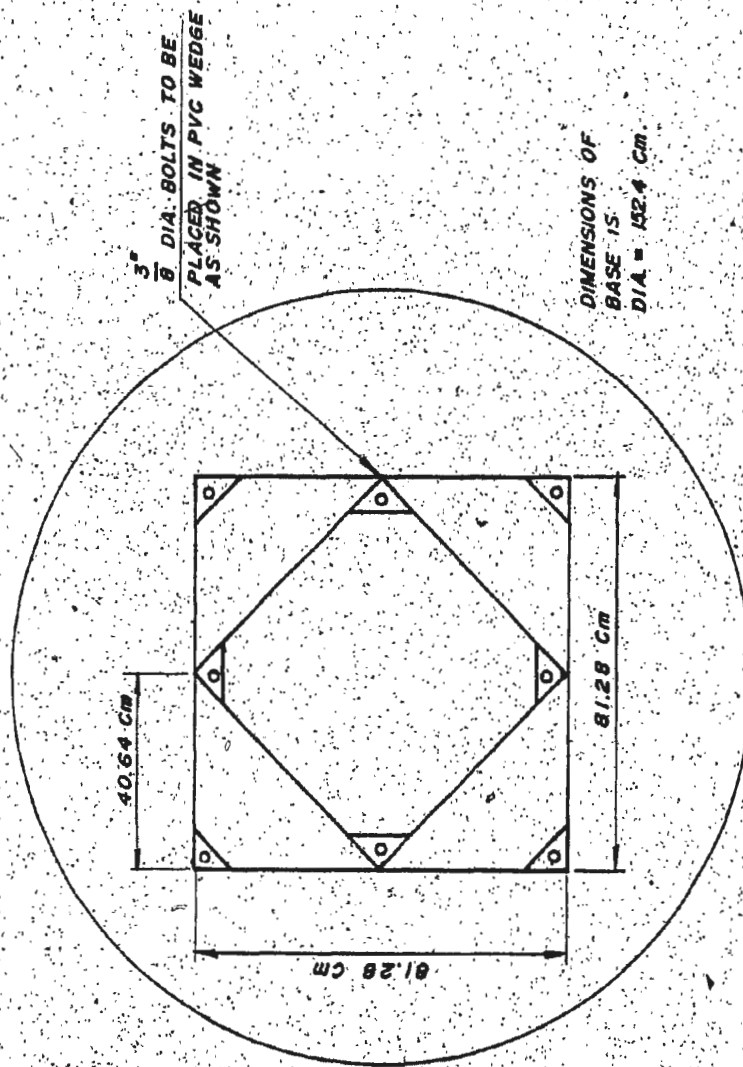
PLAN VIEW OF FOUNDATION BASE
